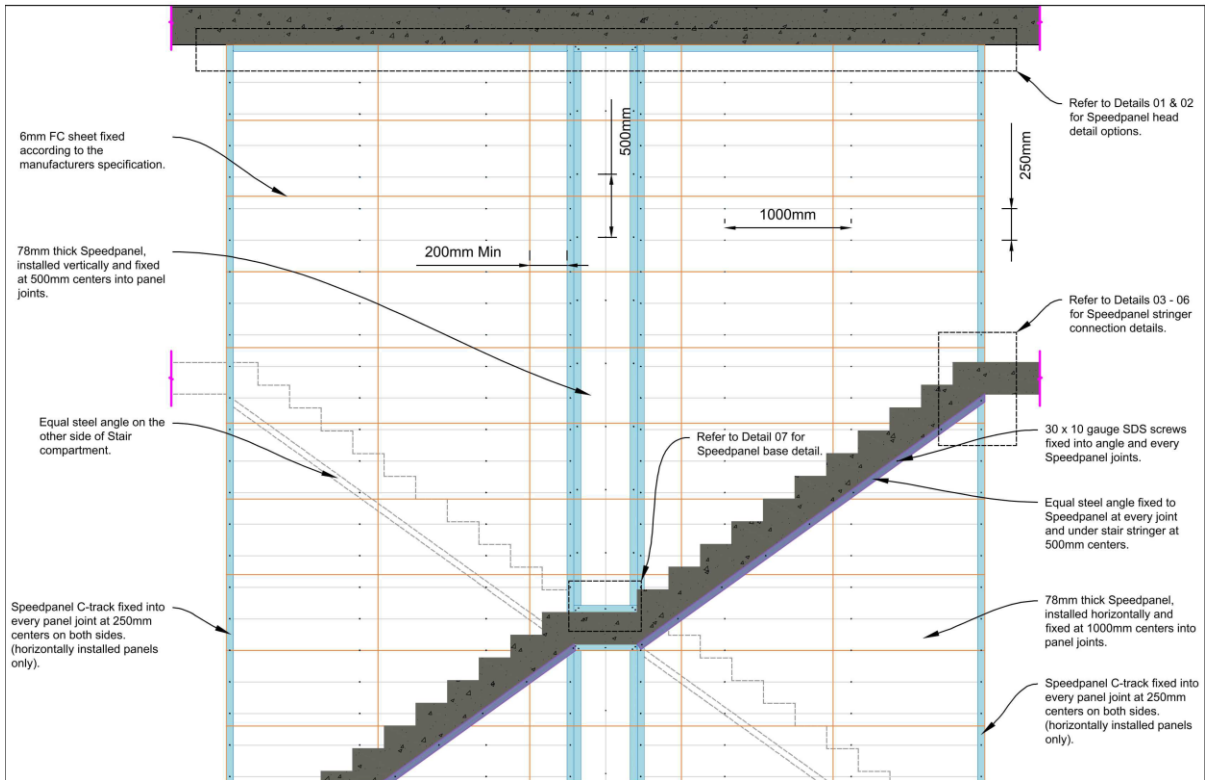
Dual stack scissor stair Elevation view (Speedpanel clad with Fibre cement sheeting)
